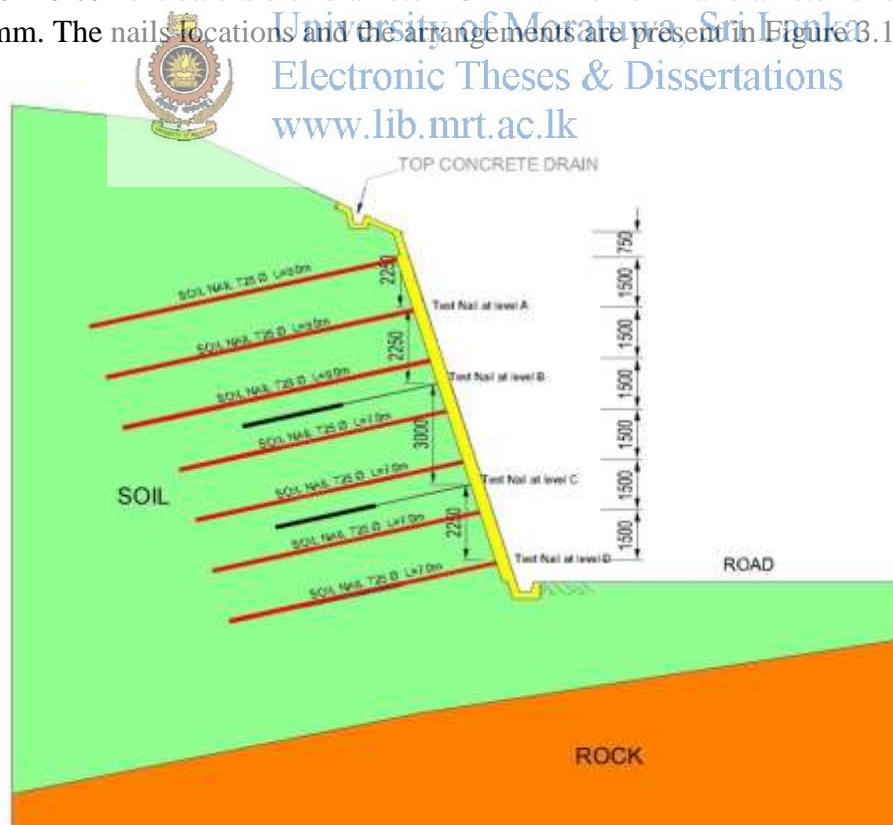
Cross Sectional View of the Design Soil Nailing Arrangement
